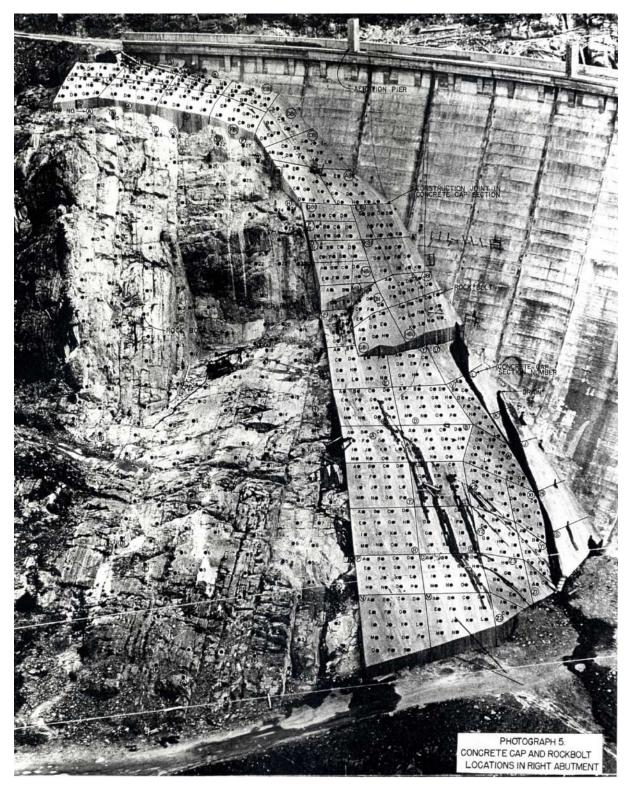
Rock Bolt Installation on Downstream Abutment as Part of Overtopping Protection (Reclamation)
